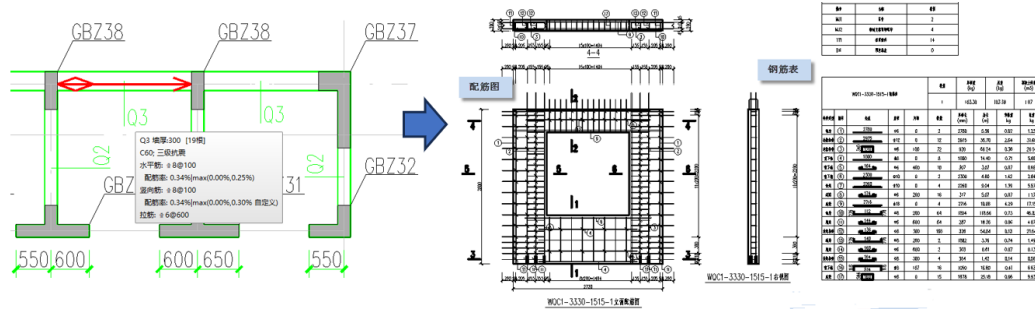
Prefabricated wall reinforcement obtaining process in YJK's built-in prefabricated building design software
